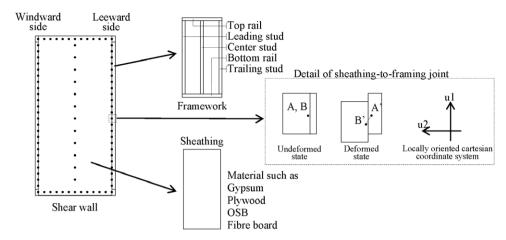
Structural components of a timber shear wall. The fastener indicated (connecting point A with point B) is shown both in undeformed and deformed state.
